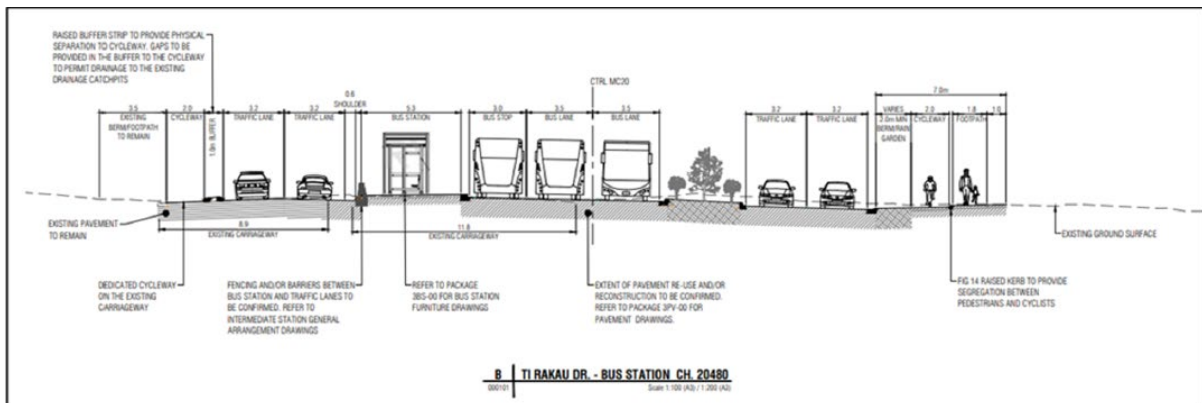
Cross Section of the Proposed Widened Ti Rakau Drive
